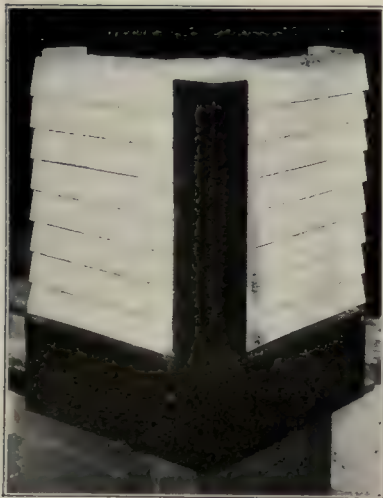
EXTERIOR VIEW, SILL, WALL, AND FLOOR CONSTRUCTION OF HOUSE.
